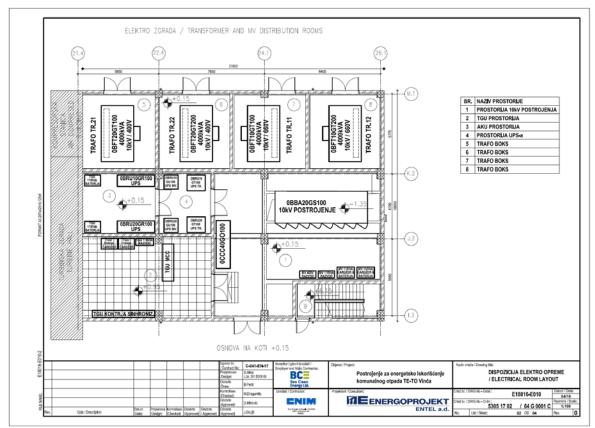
Disposition of electrical equipment (IDP, 4/1 Electrical Installation Design)
